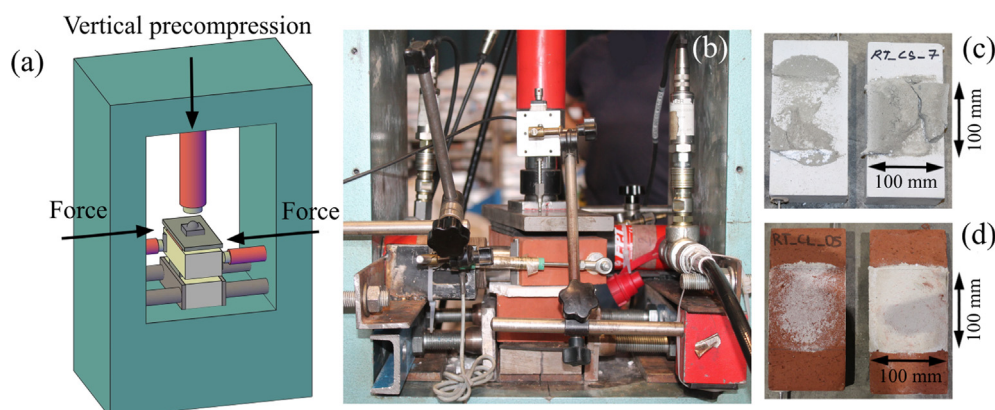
Setup for testing the torsional shear strength of bed joints (a and b) and failure modes occurring in the specimens (c and d).
